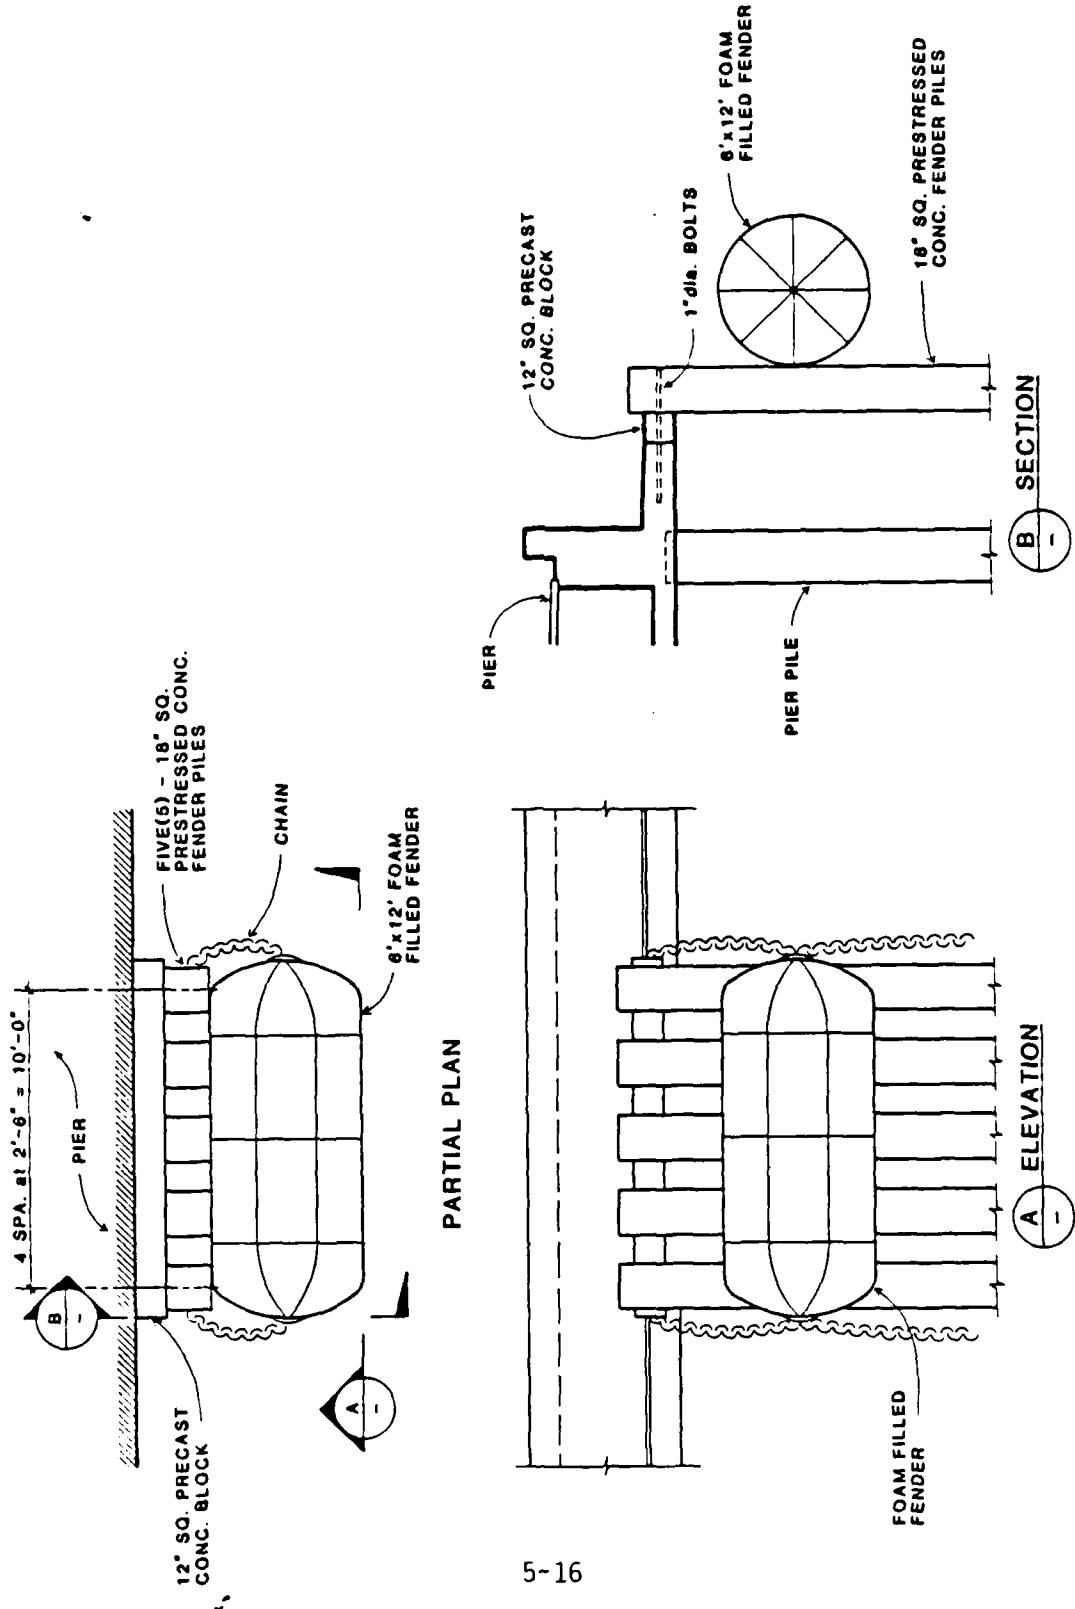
Concrete Fender System Using Concrete Fender Piles Only
